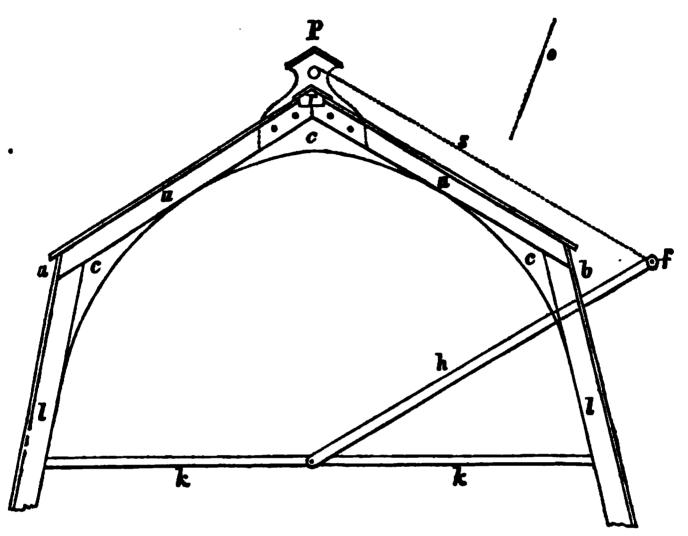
Section of the Frame of one end of the House. (Scale, 2 feet to the inch.)
